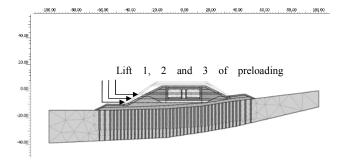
A typical FE model for the highest embankment section with SCP foundation.
